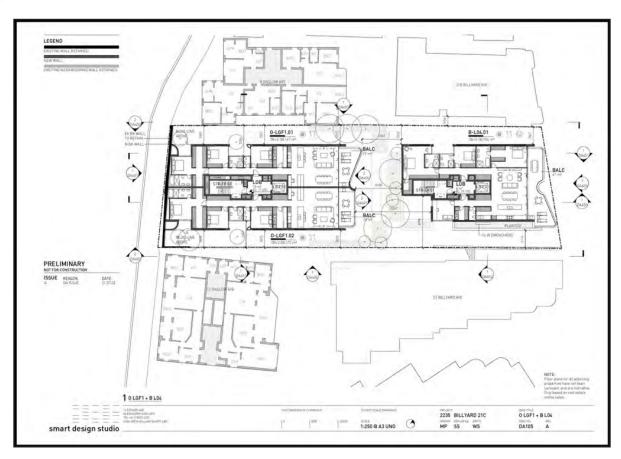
Typical floor plan of proposed design by Smart Design Studio.
